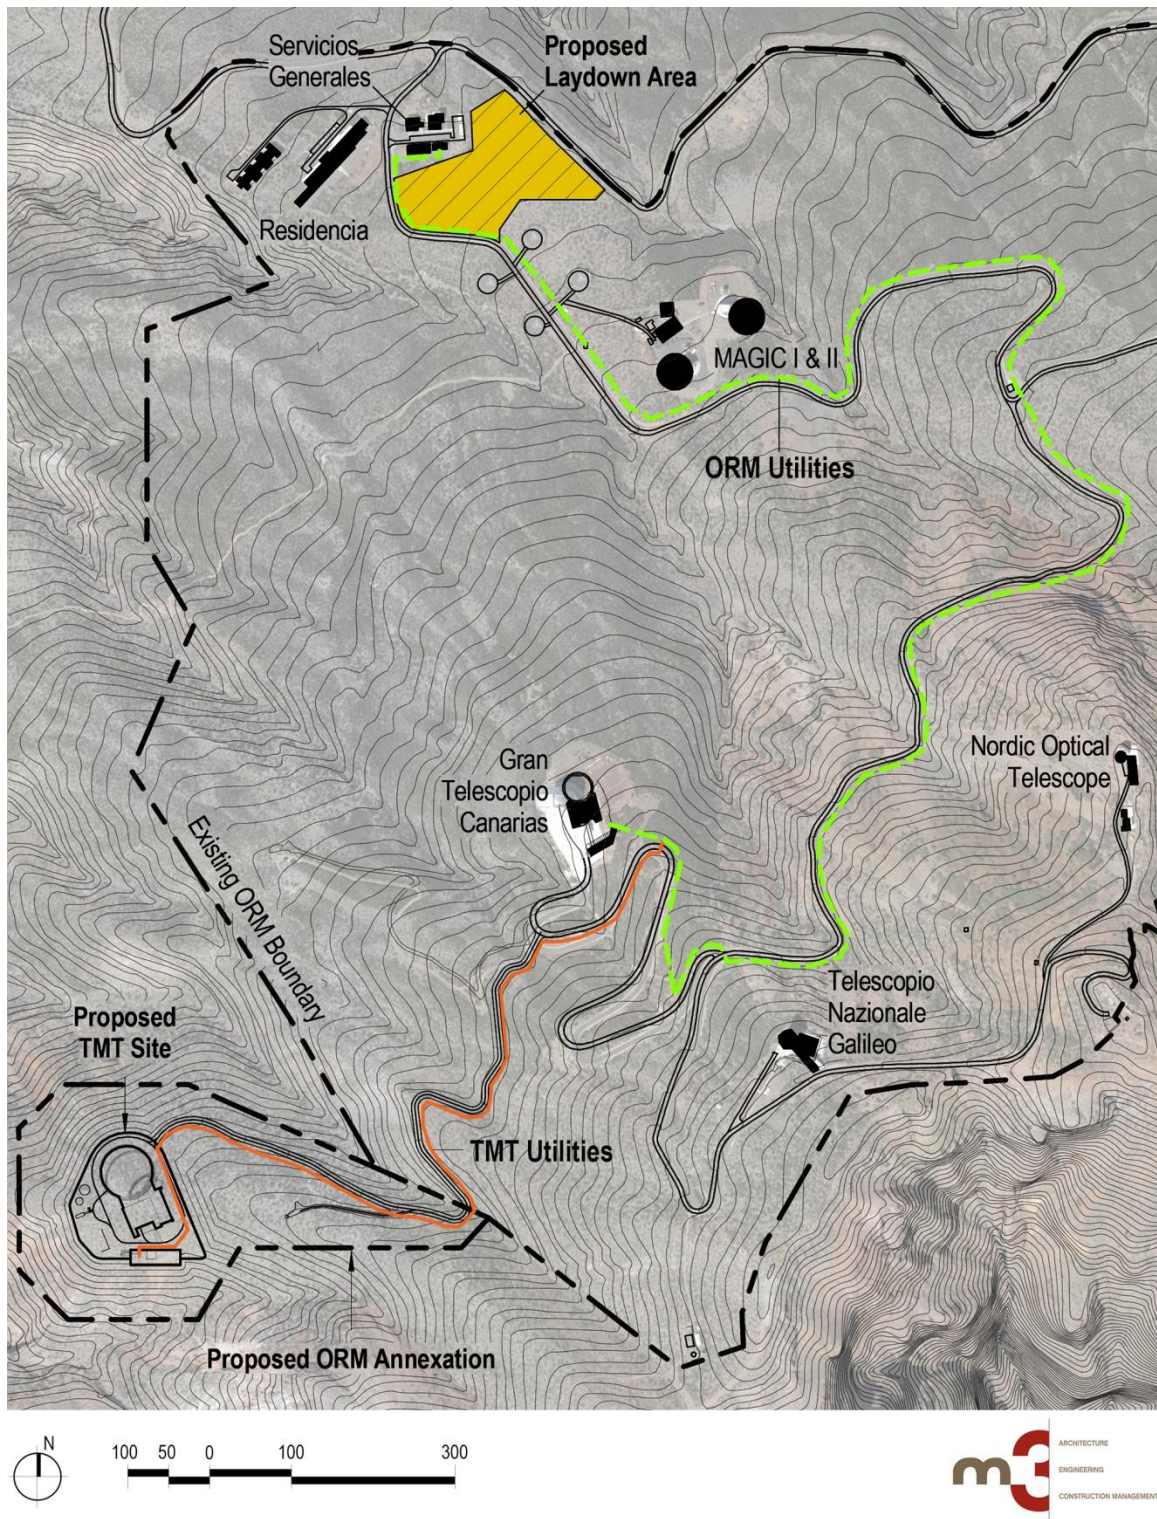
Laydown Area and proposed connection locations to the existing utilities.
